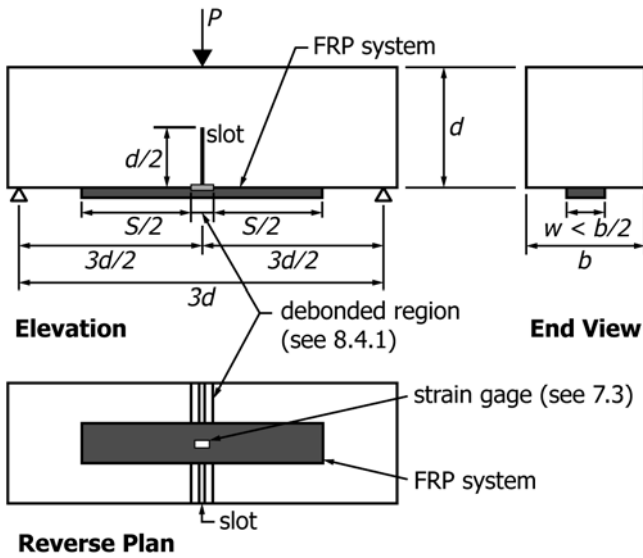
Specimen Dimensions and Details of Bonded FRP System
